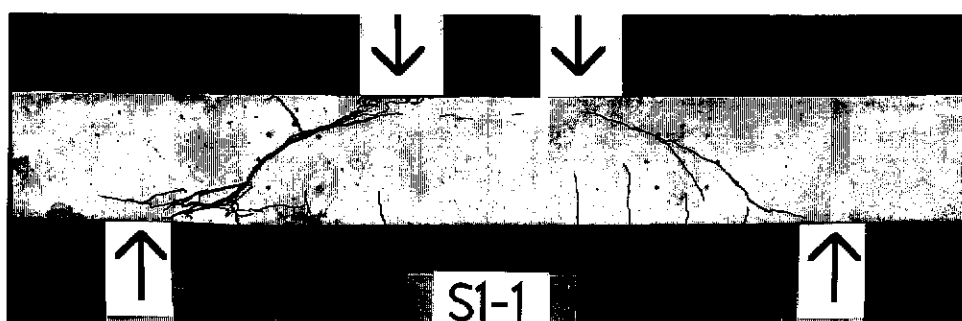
Crack Pattern of the Back Face of Beam S1-1
